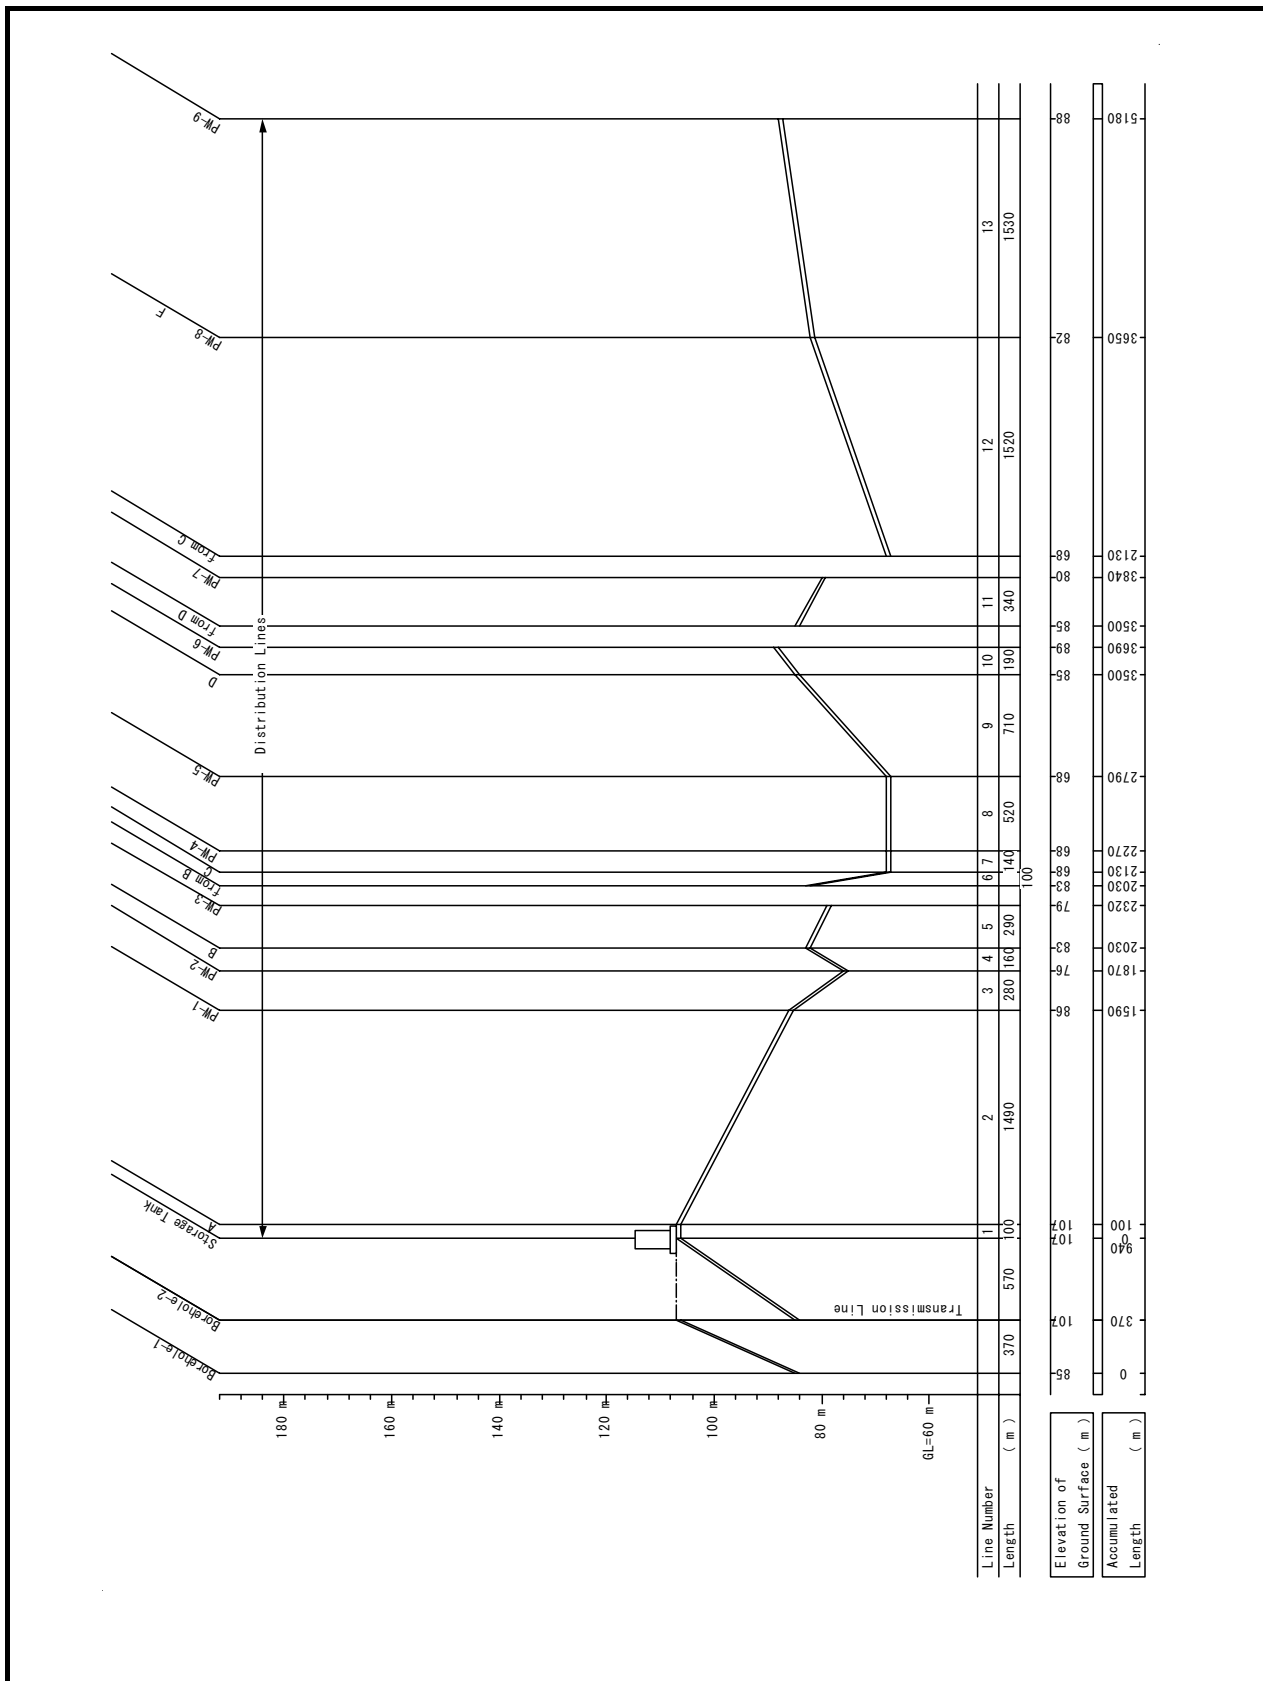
LONGITUDINAL SECTION (MWANDEGE: 8/22(1))
